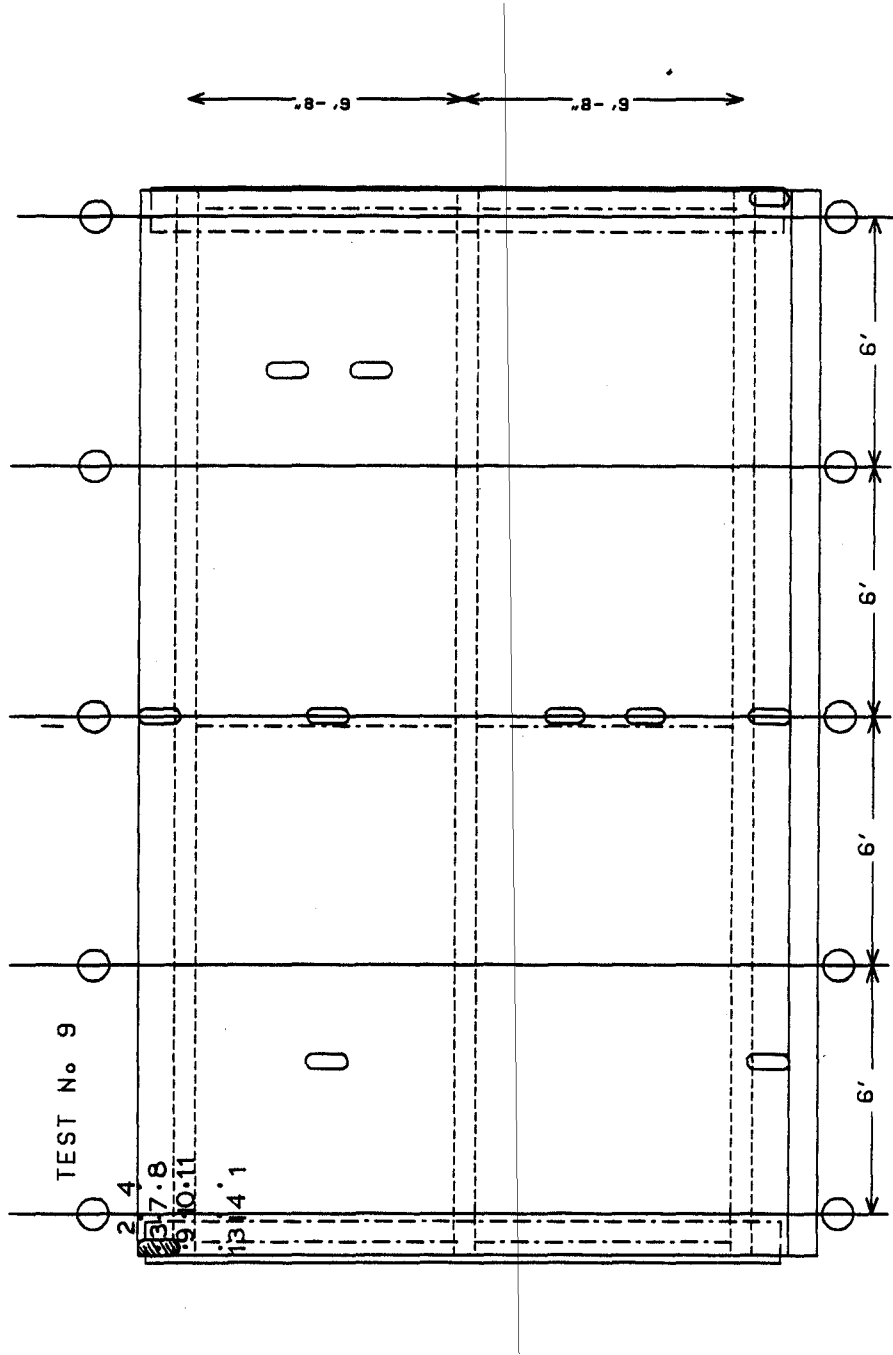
LVDT Locations (First Bridge - Test No. 9)
